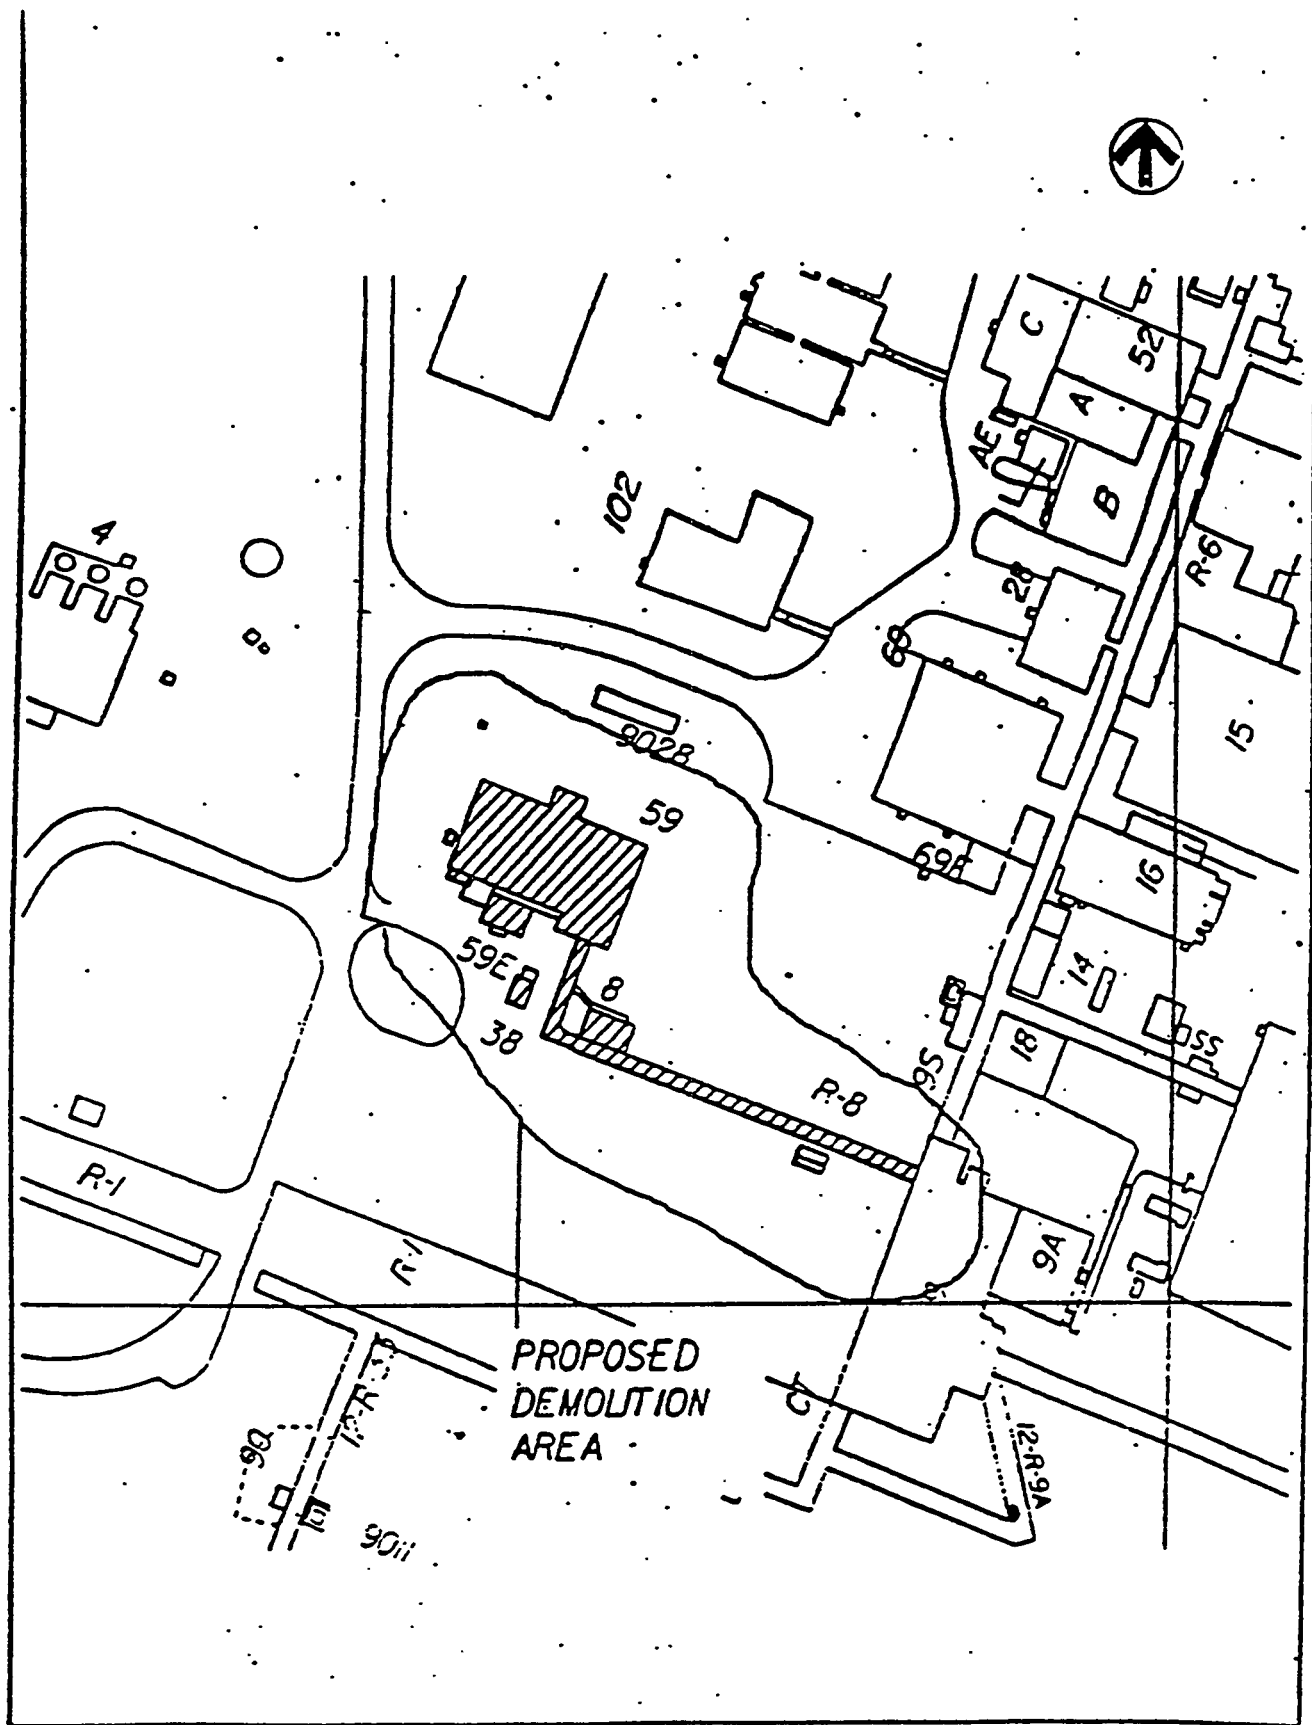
Existing Analytical Chemistry Laboratory Facilities
